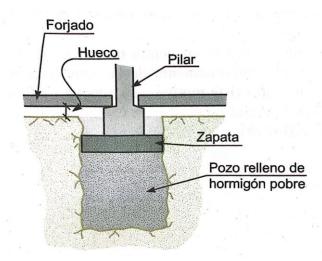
Section of a well foundation. Source: Ingenieria geológica (Gonzalez de Vallejo, 2002)
